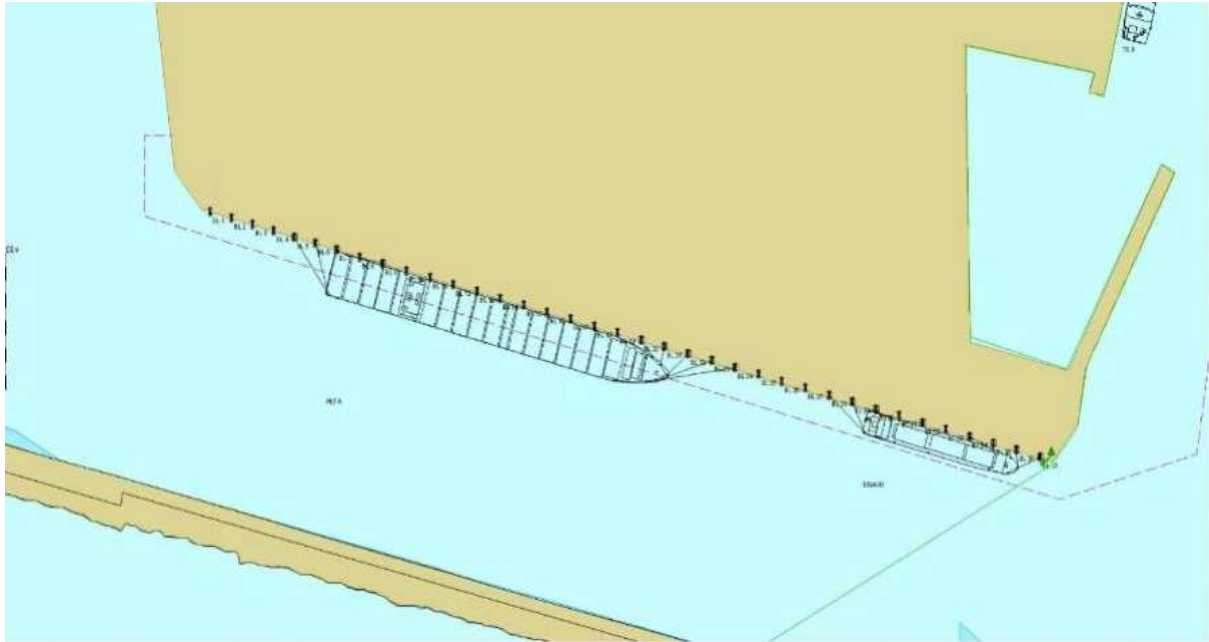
Detailed view of mooring infrastructure at the Bettolo terminal
